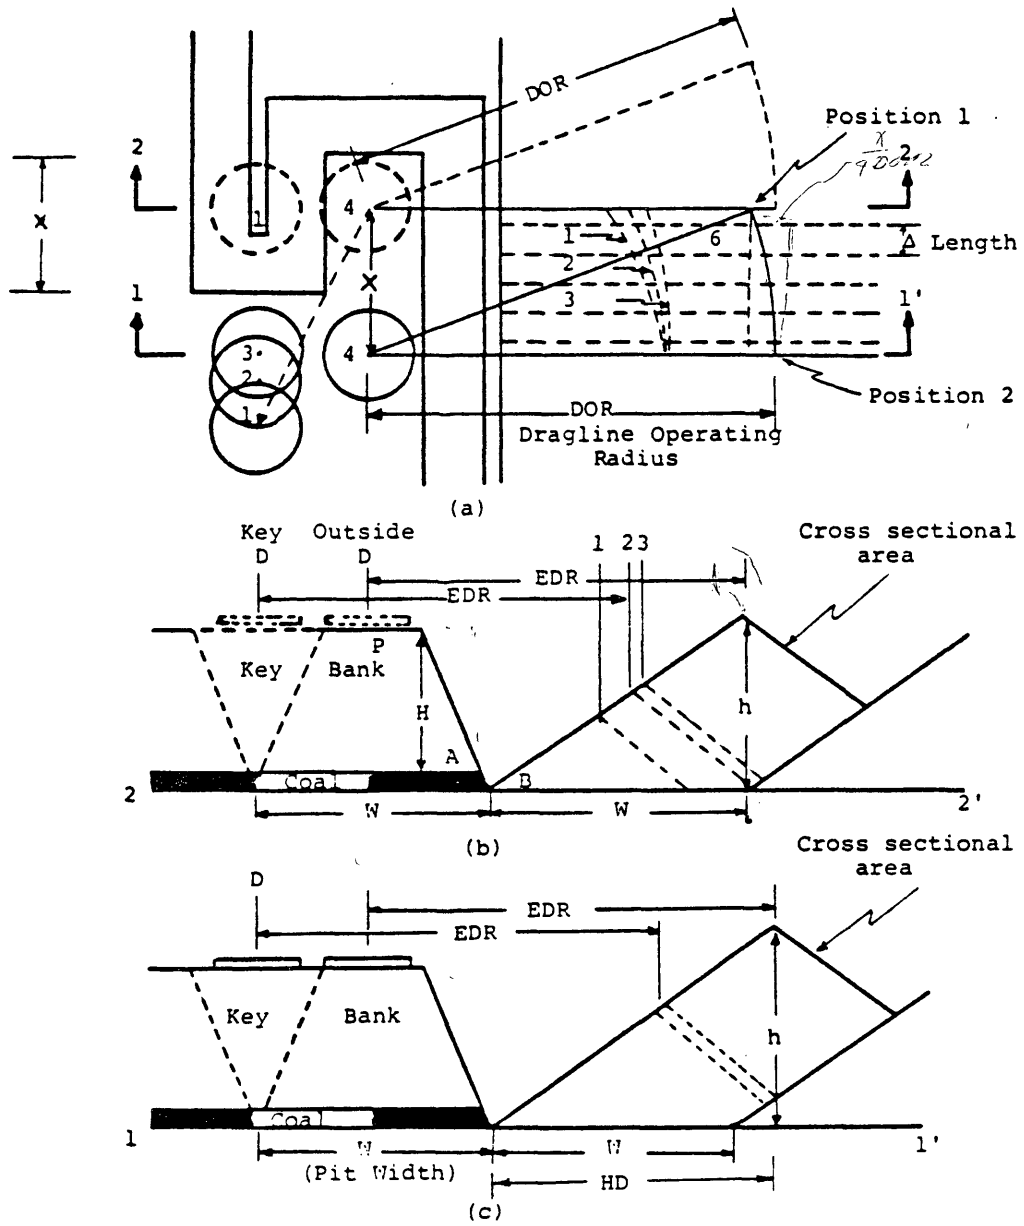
Plan and Cross Sections of Dragline Positions, Spoil Location and Required Dragline Spoil Radius.
